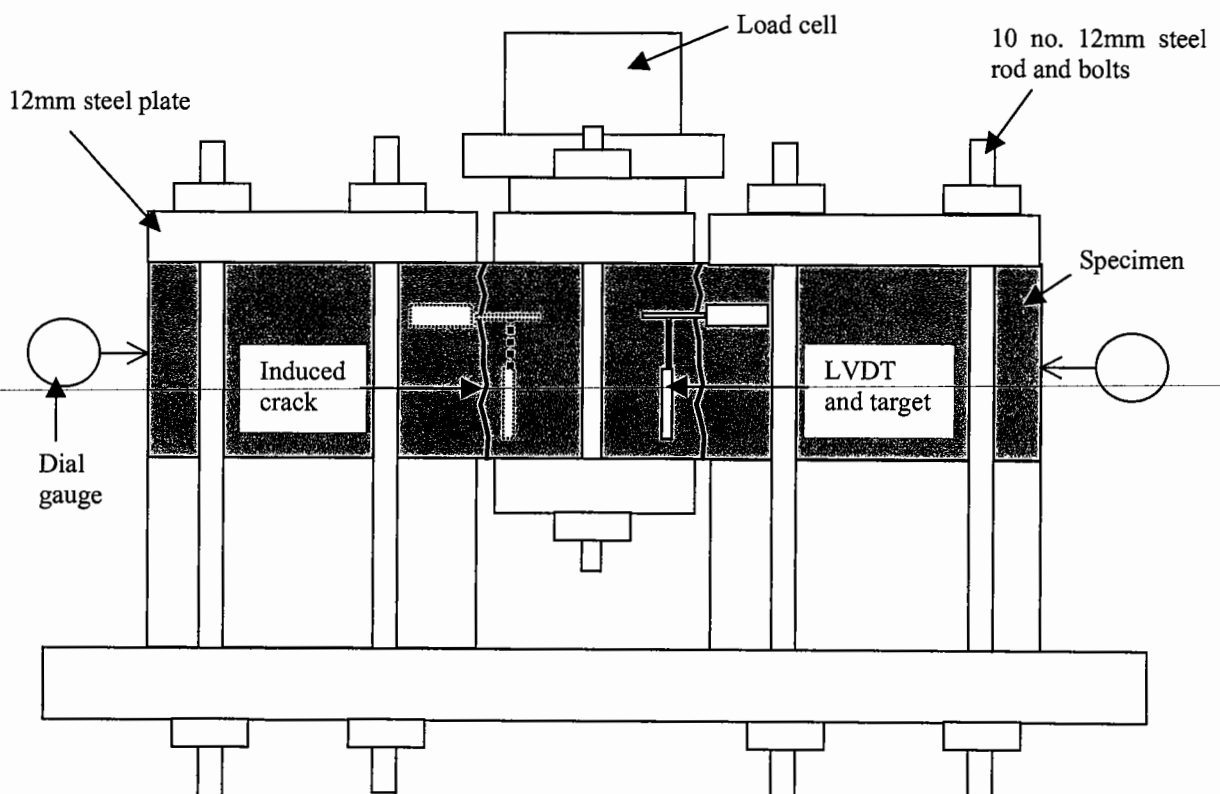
Method used to induce cracks in beam specimens
